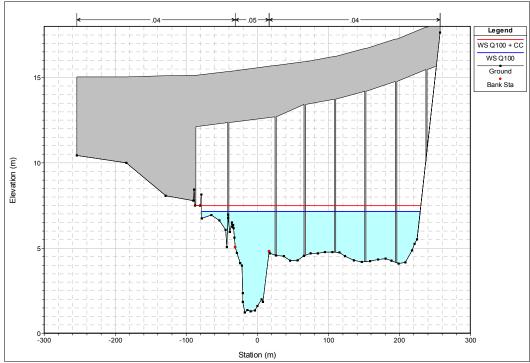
Option 5 Viaduct bridge crossing supported on 7 piers (6 no. located within the floodplain
